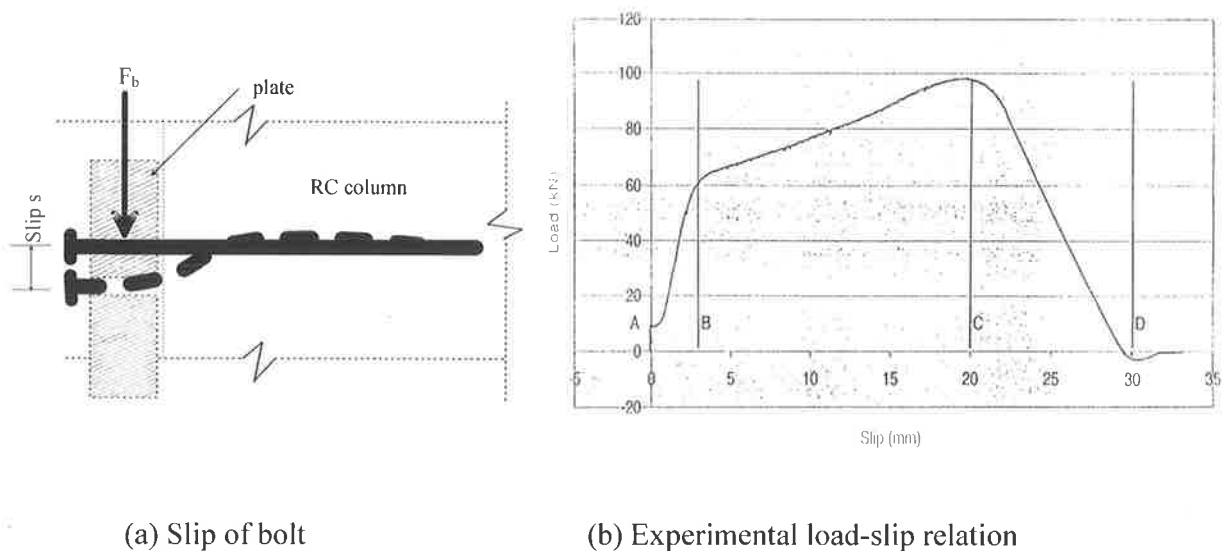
Typical load-slip relation of an anchor bolt (Teh et al. 1999)
